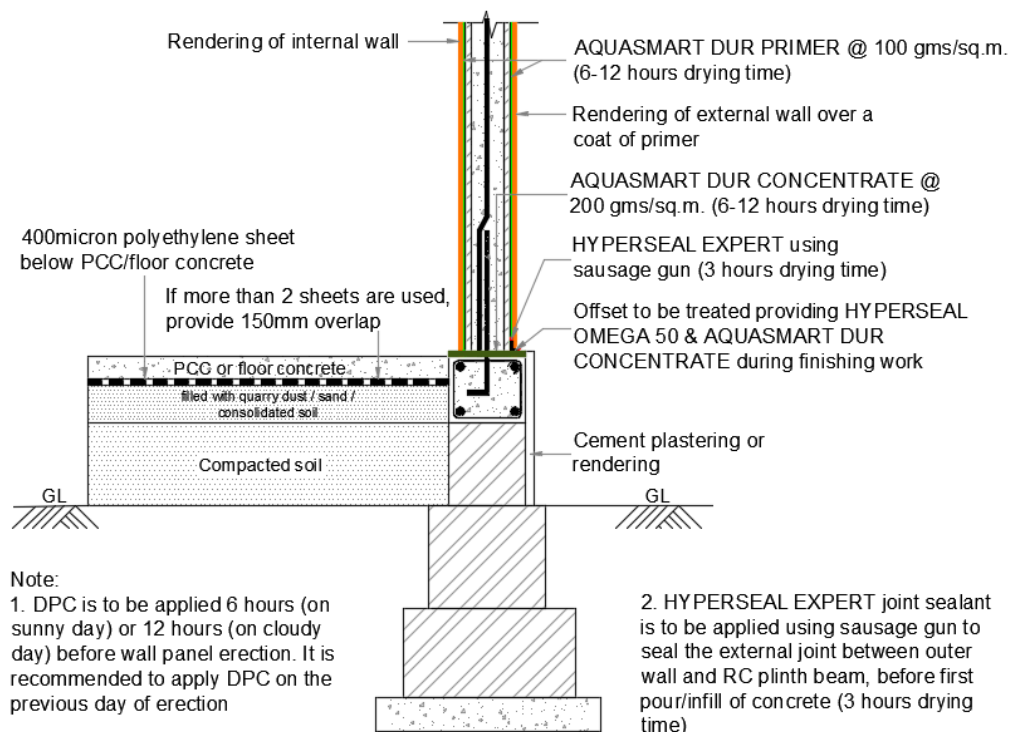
Foundation, basement and plinth beam with starter bars and GFRG panels in position, flooring and joint between GFRG panel and RC plinth beam)
